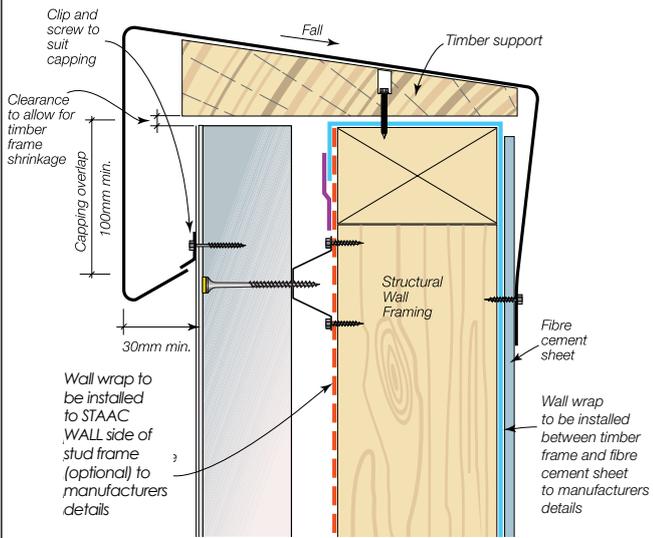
Roof to wall junction detail – Option 2
